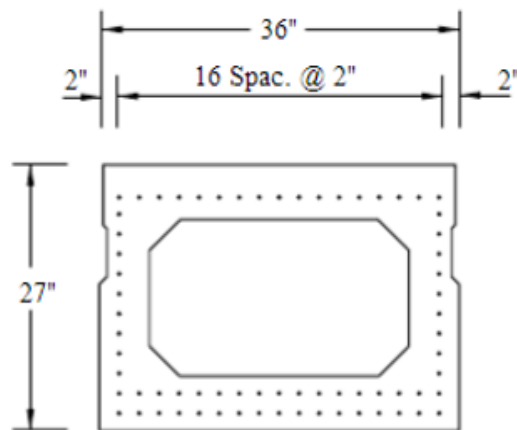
Prestressing strand layout for standard AASHTO Type BI-36 box beam.
